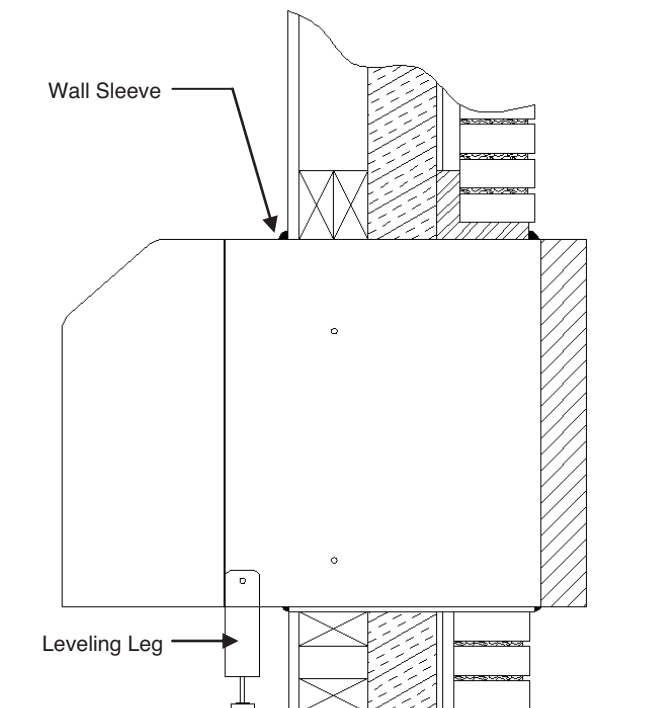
Leveling Leg Installed on Wall Sleeve
